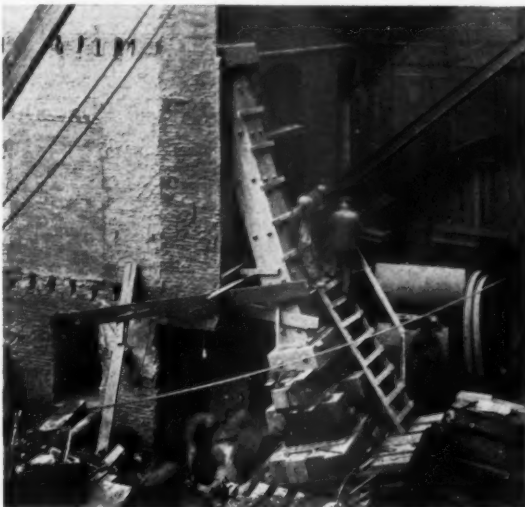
Spur shore at the northeast corner of the Beaver Street wing of the Welles Building before caisson was installed
